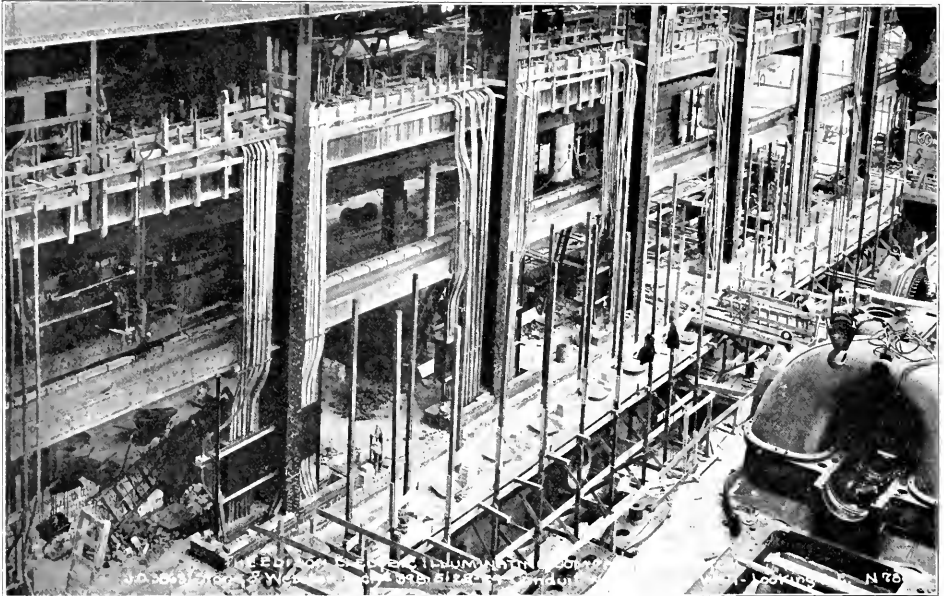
CONDUIT WORK BETWEEN TURBINE ROOM AND BAY, WEYMOUTH POWER PLANT
